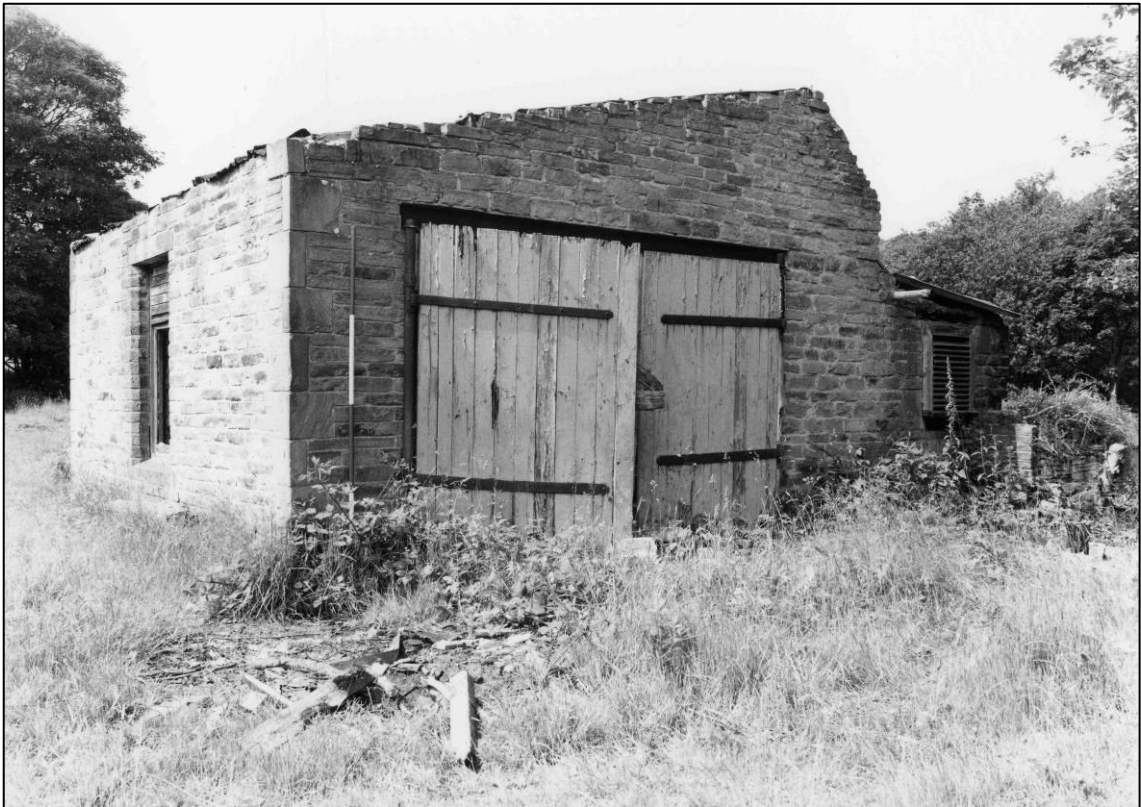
Building N4, external east elevation, looking NW (photo 5/18).
